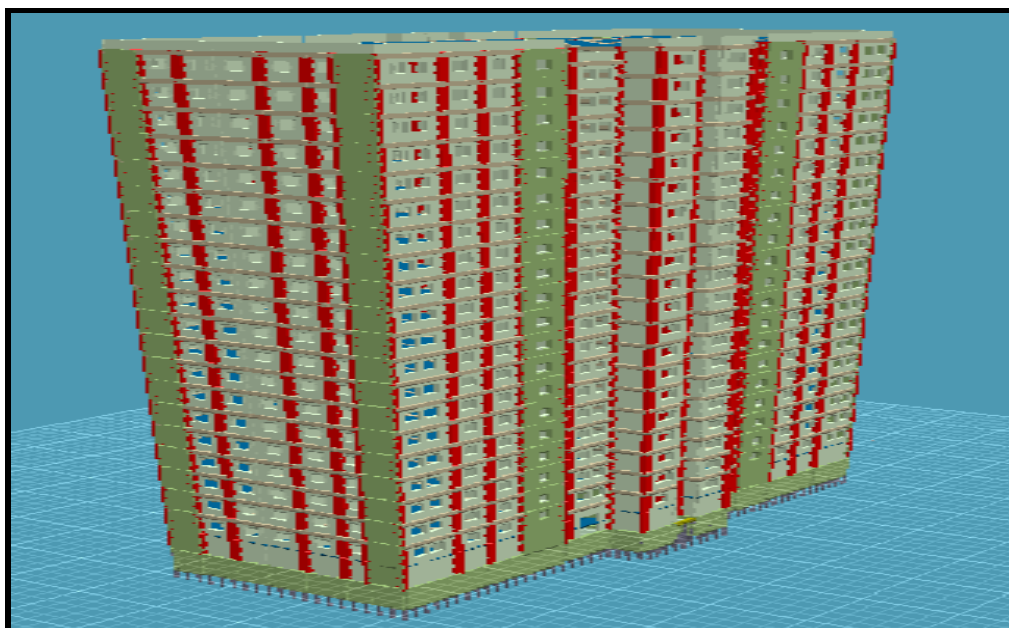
the 3D View of a Building with Twenty Stories and Coupled Shear Wall
